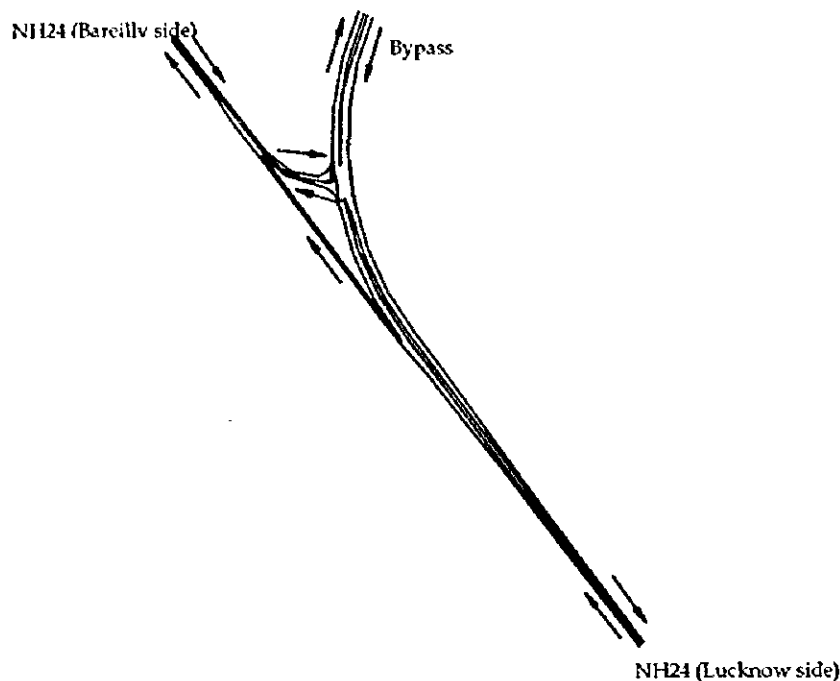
Layout of the Intersection at the End Point of Bareilly Bypass
